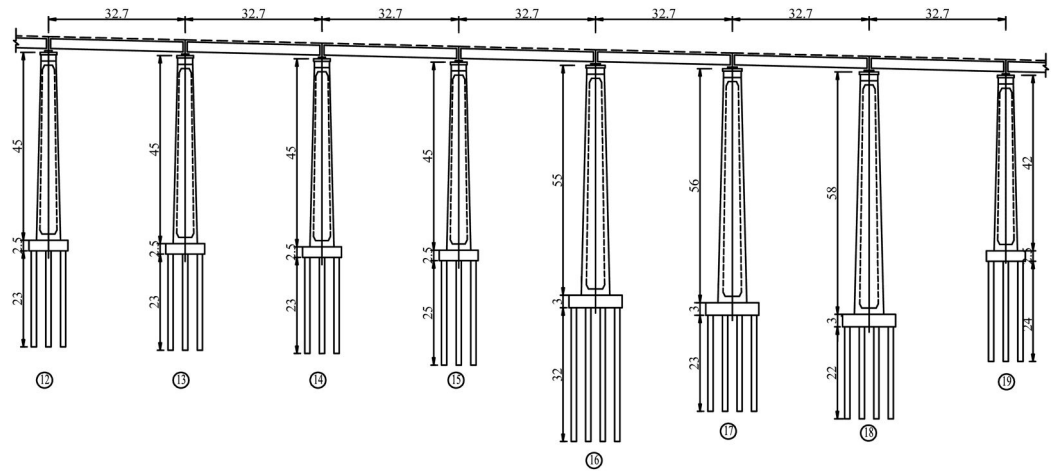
Front view of a typical railway bridge with tall piers (unit:m).
